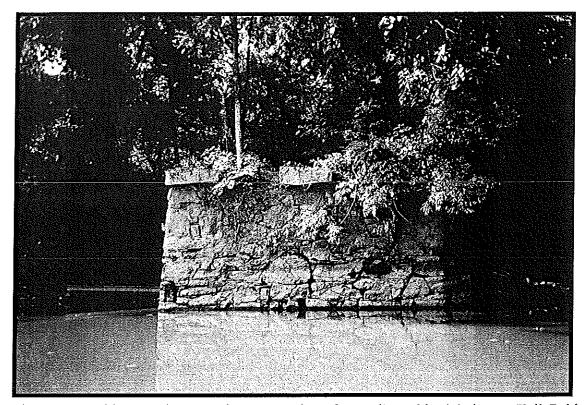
Looking south at southernmost pier of Beard's Bridge/Piedmont Toll Bridge; note stonework and capstones
